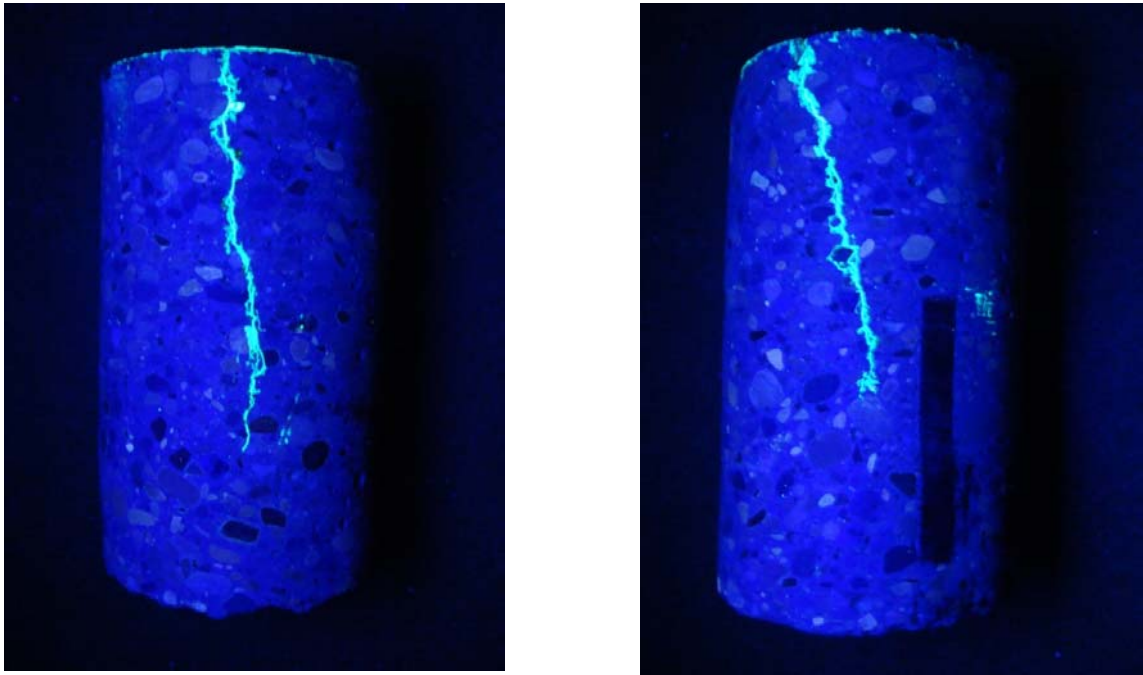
Core STS2 (left) northwest elevation (right) southeast elevation
